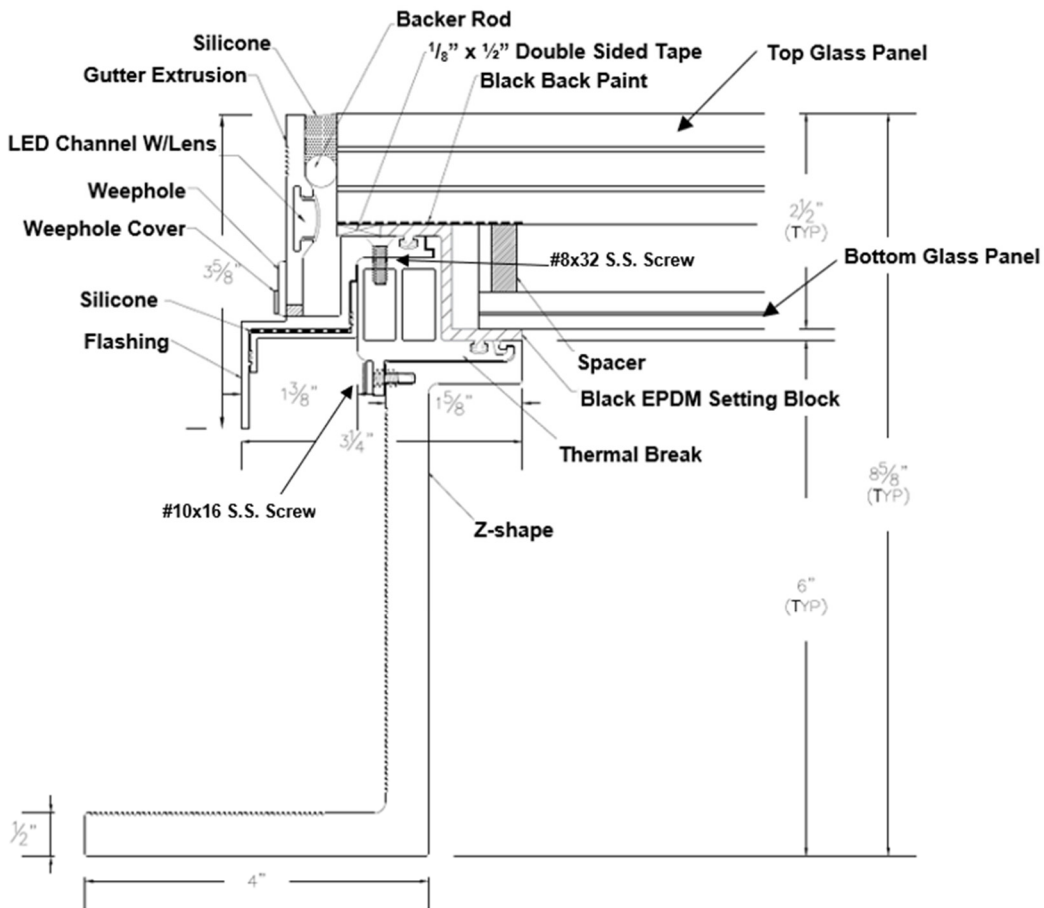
EXAMPLE PERIMETER CROSS SECTION
